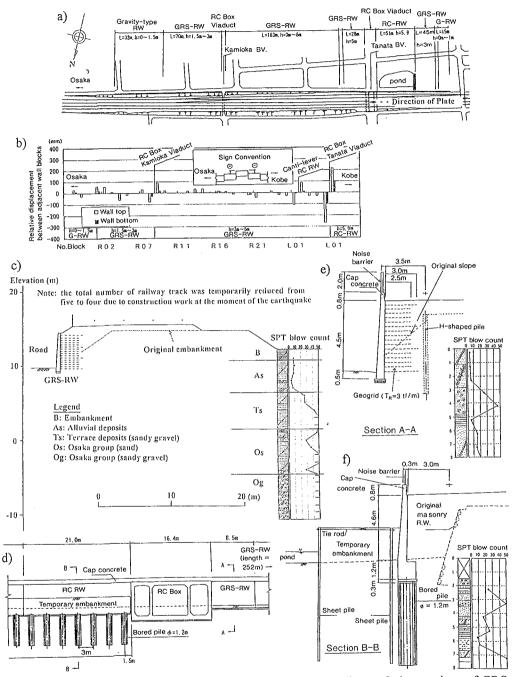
a) plan of the site, b) relative displacement between adjacent facing sections of GRS-RW and cantilever RC RW, c) cross-section of embankment, d) front view from south of GRS-RW and cantilever RC RW, e) typical cross-section of GRS-RW, and f) typical cross-section of RC RW at Tanata (see Fig. 1, and sites CL3 and GR1 in Fig.2)
